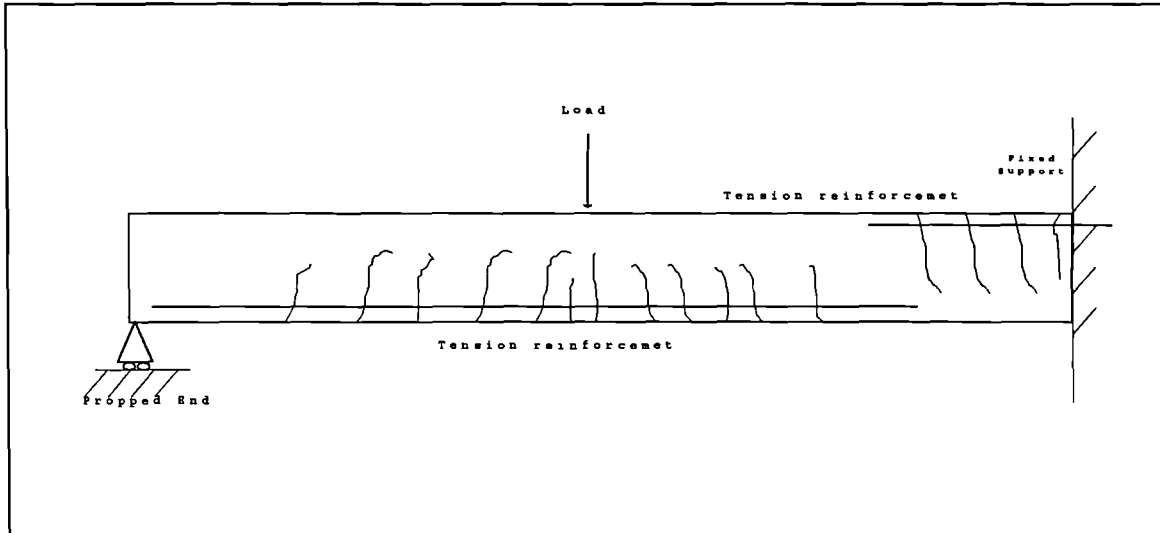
Crack development in a reinforced concrete beam in bending
